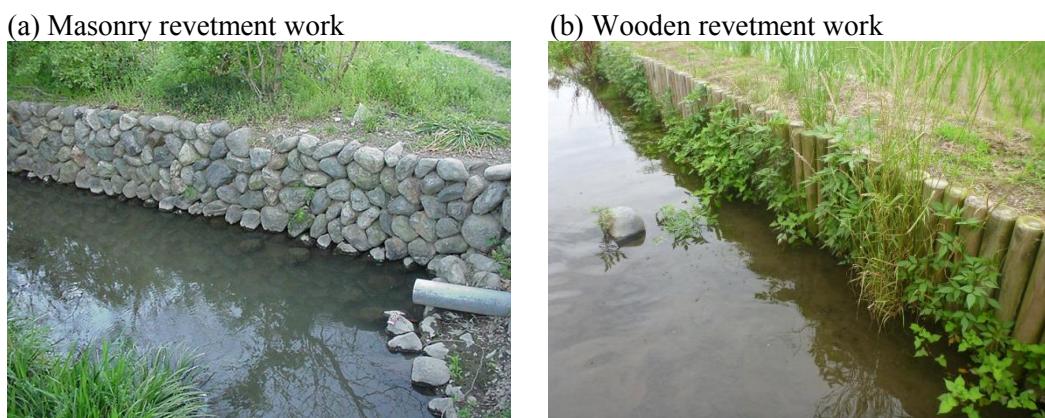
Example of (a) masonry and (b) wooden revetment works in canals
